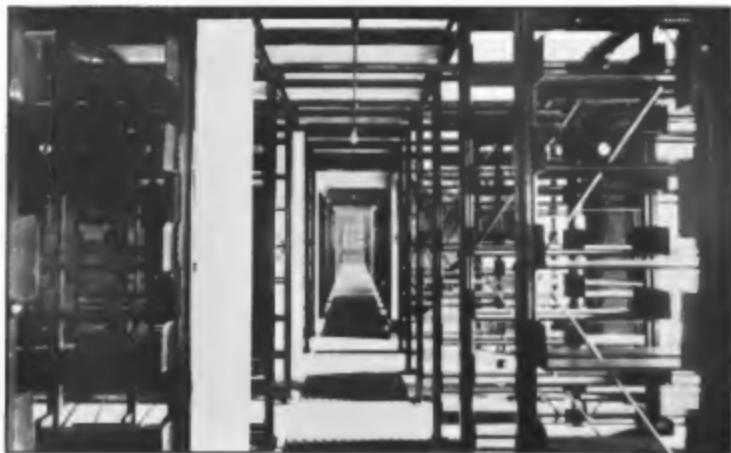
STEEL LIBRARY FITTINGS BY ROSEO, LTD., OF LONDON.
